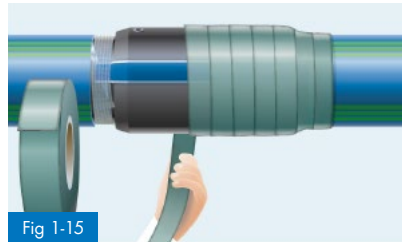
Step 1: Waterproof insulation of the electrical joint (dimensions of up to OD 90 mm)
